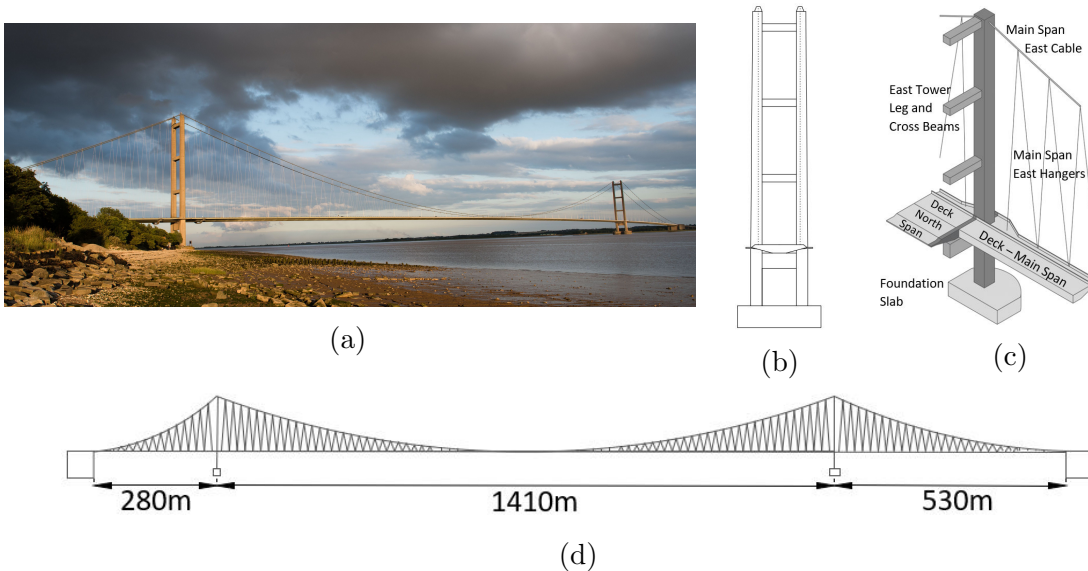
Suspension bridge, (a) photo of the bridge (b) bridge deck section showing elevation of the tower, (c) annotated stepped section of the north tower and (d) elevation of the bridge.
